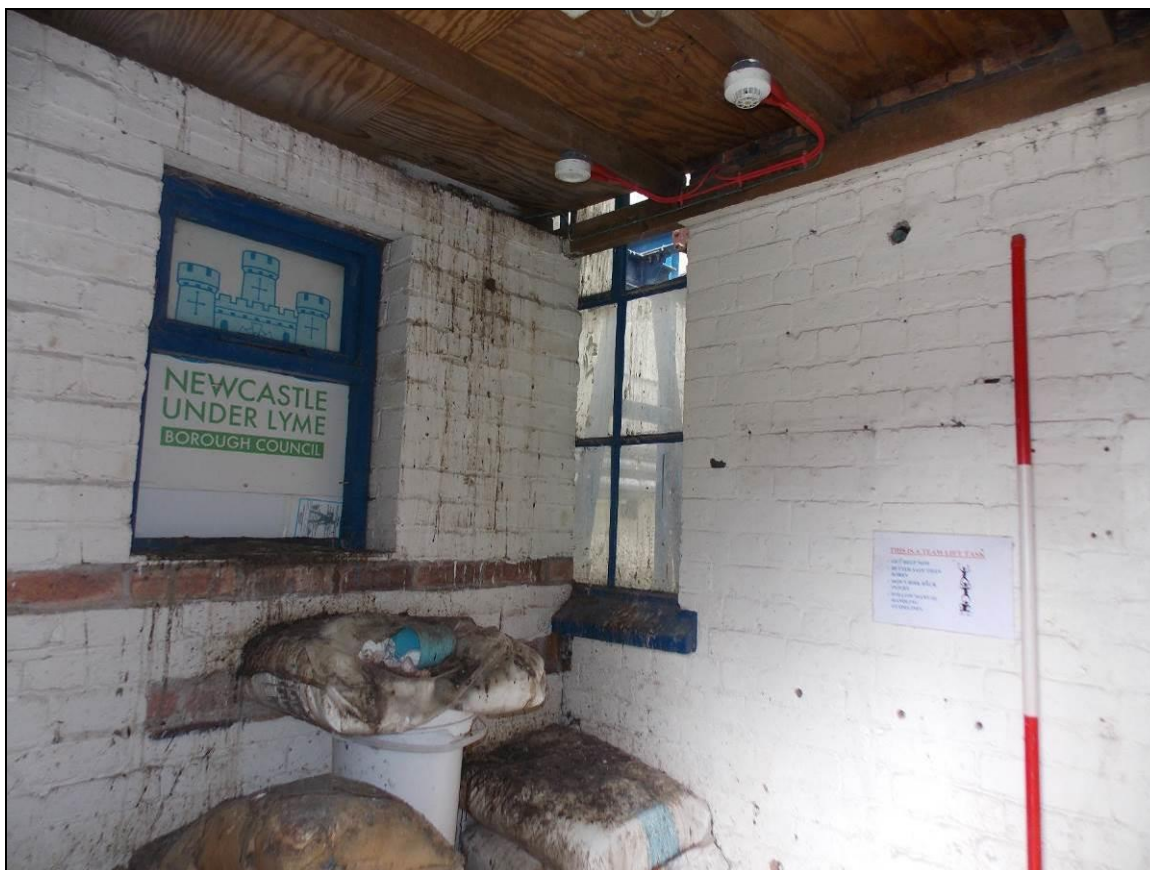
Internal view of the extension against an original window, looking north-west (scale 2m).
